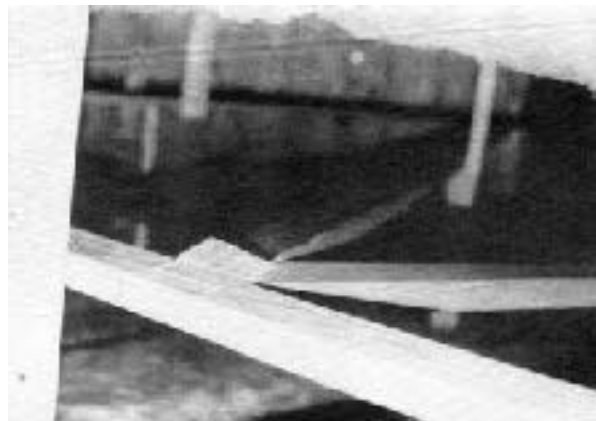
This truss plate came loose because of improper handling. Damaged trusses should not be repaired in the field.
